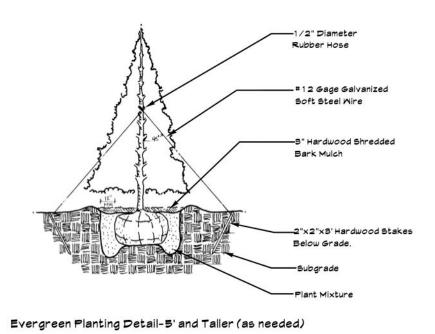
EXHIBIT E LANDSCAPE PLAN – GREENBELT (HIGHLAND ROAD/M-59)
